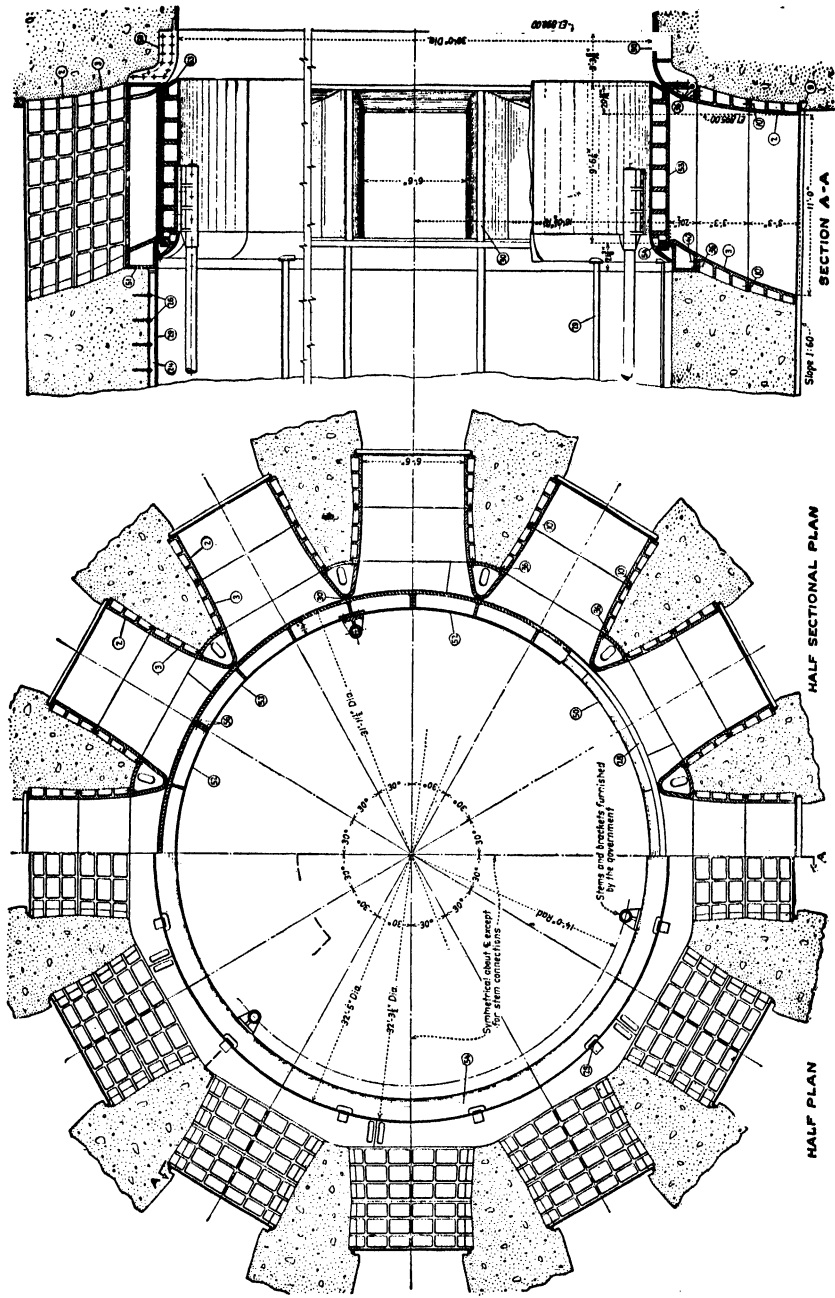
General assembly of lower cylinder gate in base of intake tower (see Fig. 26), showing radial water passageways through tower walls.
